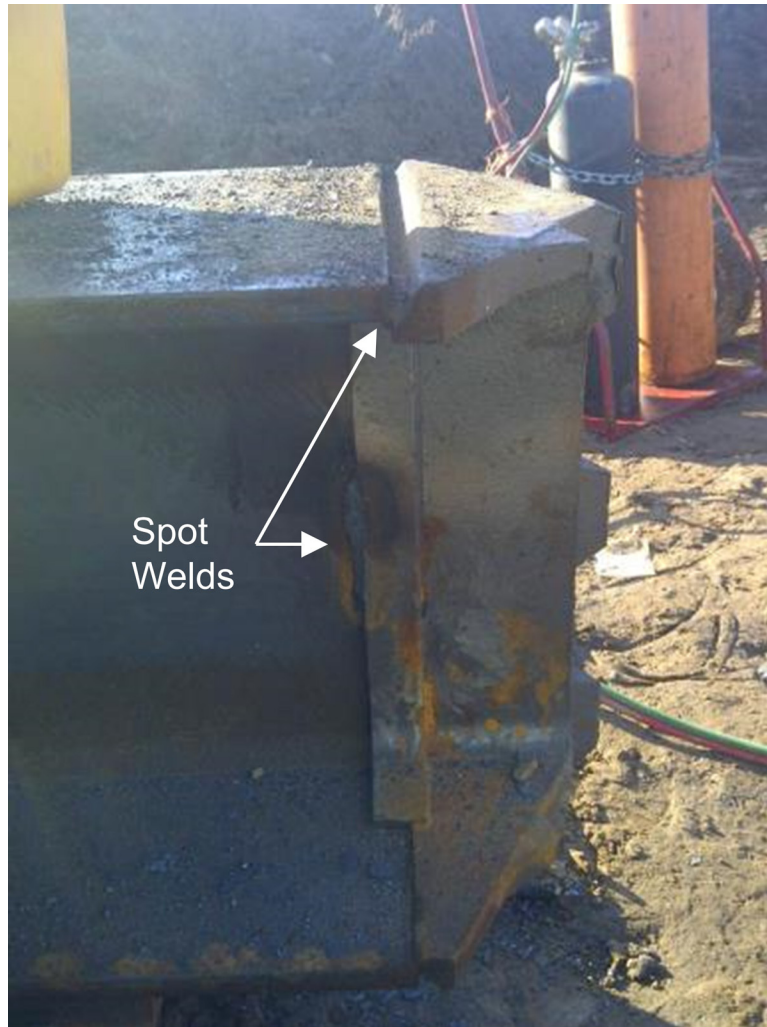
Unsatisfactory spot welds used for shoe attachment.
